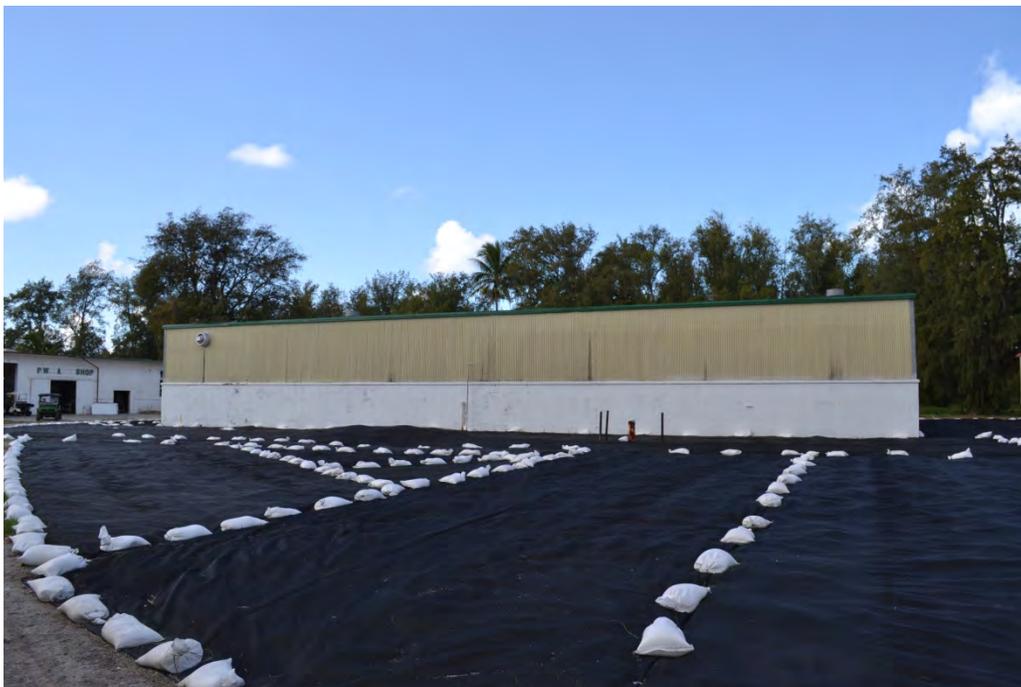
10/18/11 - Looking North west @ Shadecloth deployed along the south facing wall of Bldg 349
